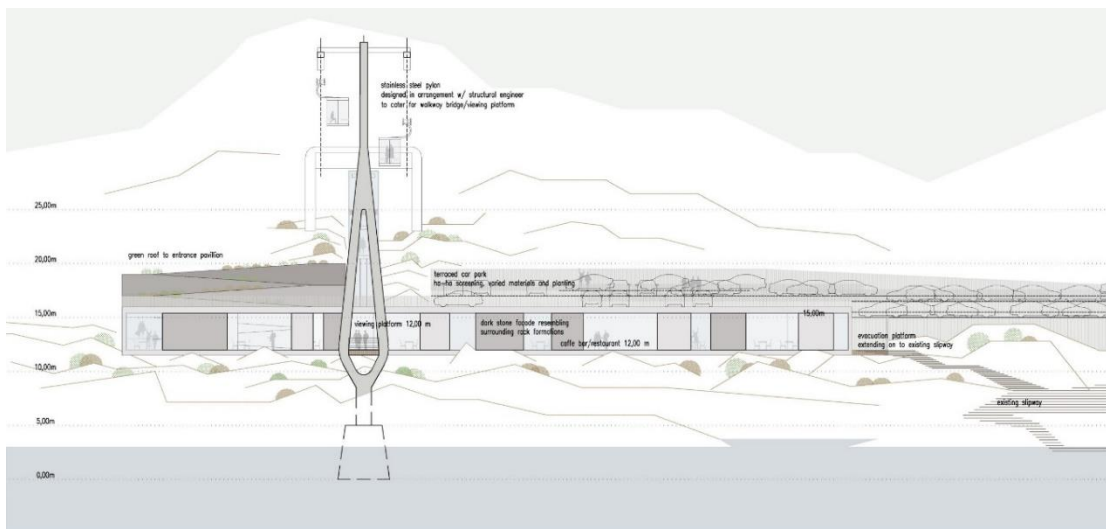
Option 1 architectural elevation showing the 'wishbone' pylon structure with integrated viewing platform
